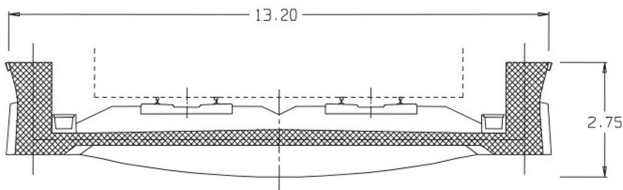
Bridge over the Ebro River. Approach spans cross section.
